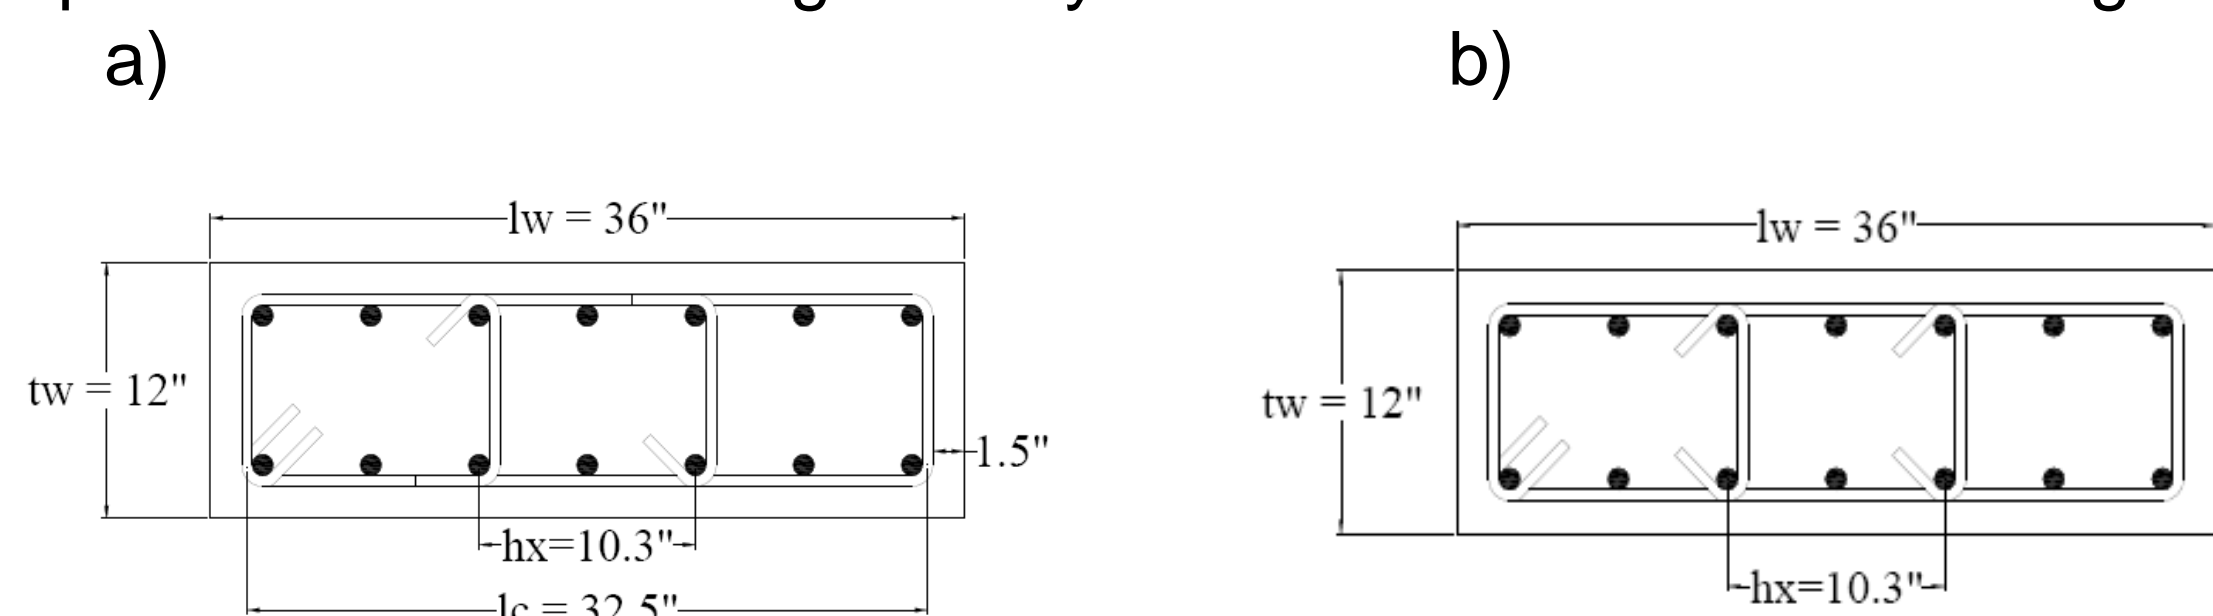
Reinforcement layout. a) 2012 Wall 3 b) 2013 Wall 5.
